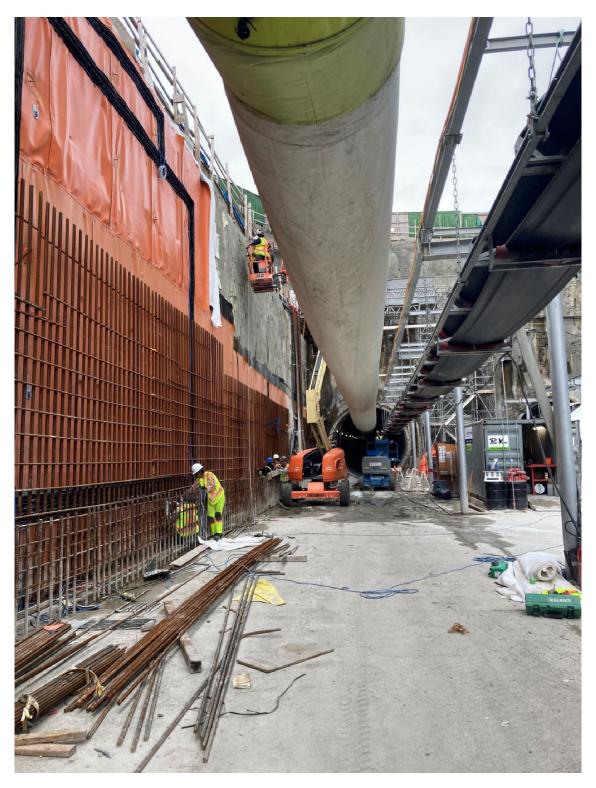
Great Northern Way-Emily Carr Station: Progressing with the installation of rebar to form the walls for the station box.
